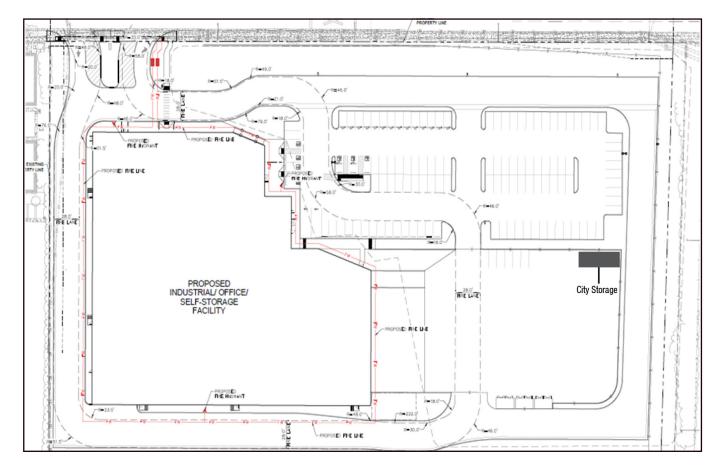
Proposed Circulation Plan - Truck Access Special Events Area
